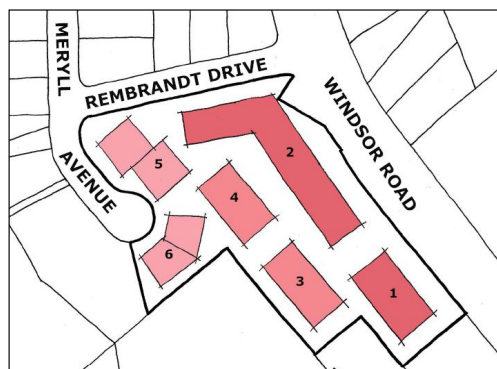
Windsor Road Precinct – Building Setbacks Key Diagram
